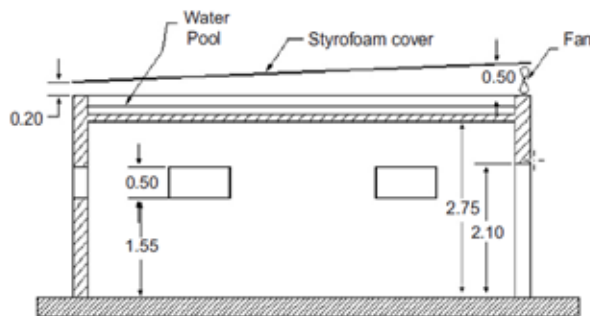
Section of room including pool and cover. (Kharrufa and Adil, 2008)
